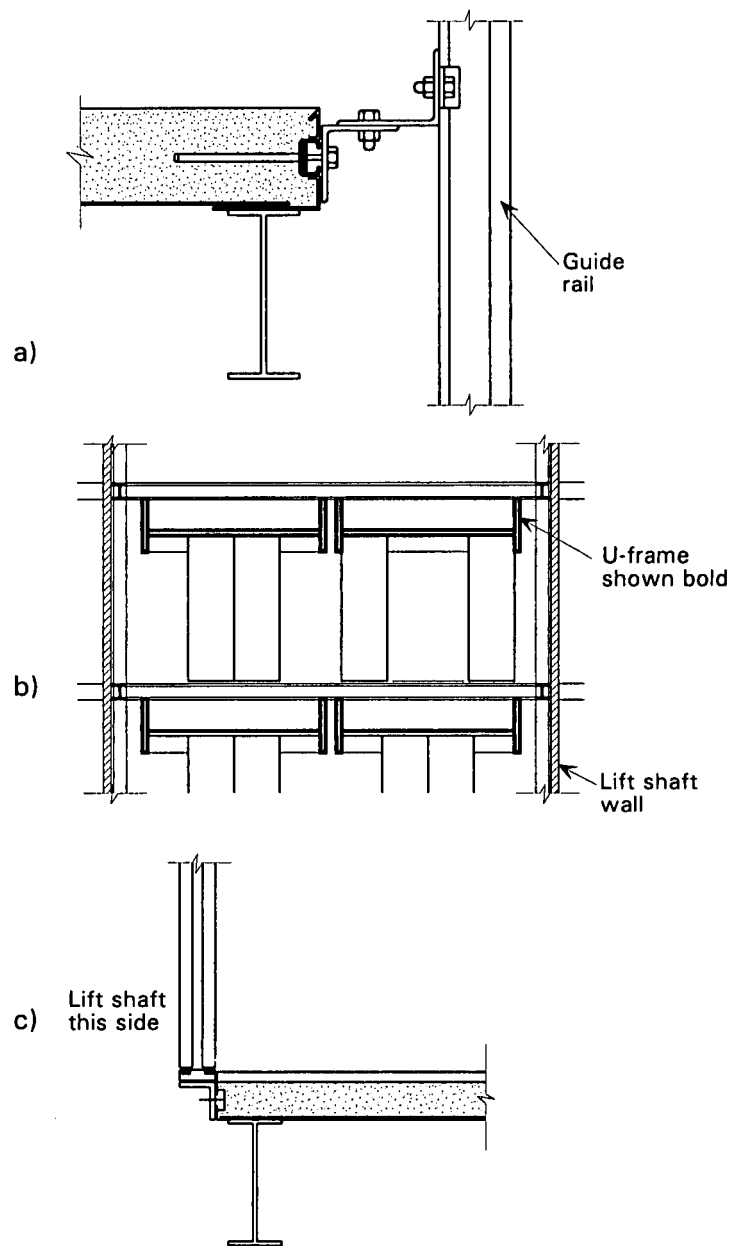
Lift installation connection details, (a) guide rail connection to slab edge, (b) suspended door support steelwork, (c) threshold
